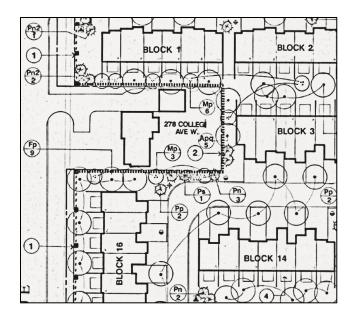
FIGURE A: Approved Landscaping Plan (drawing L-1) for 302 College Avenue West, showing continuous lines of trees surrounding 278 College Avenue West (subject property). The Landscaping Plan was approved as part of Site Plan Application No. SP91B027 (as-built landscaping drawing prepared by MTBW Group, approved December 22, 1992).
